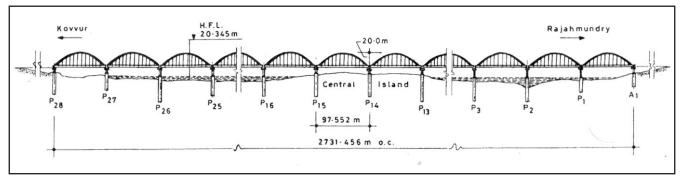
Longitudinal section of the third Godavari Bridge showing span arrangement
